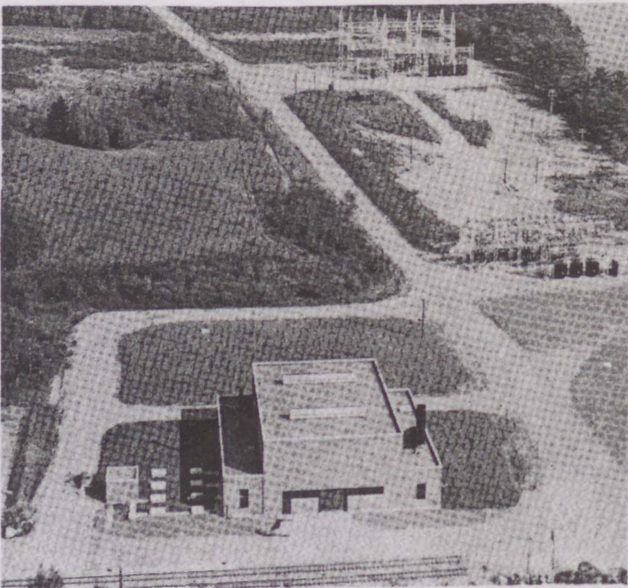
SIMPLE BUILDING of brick and steel adjacent to sub-stations houses gas turbine with space for second unit
